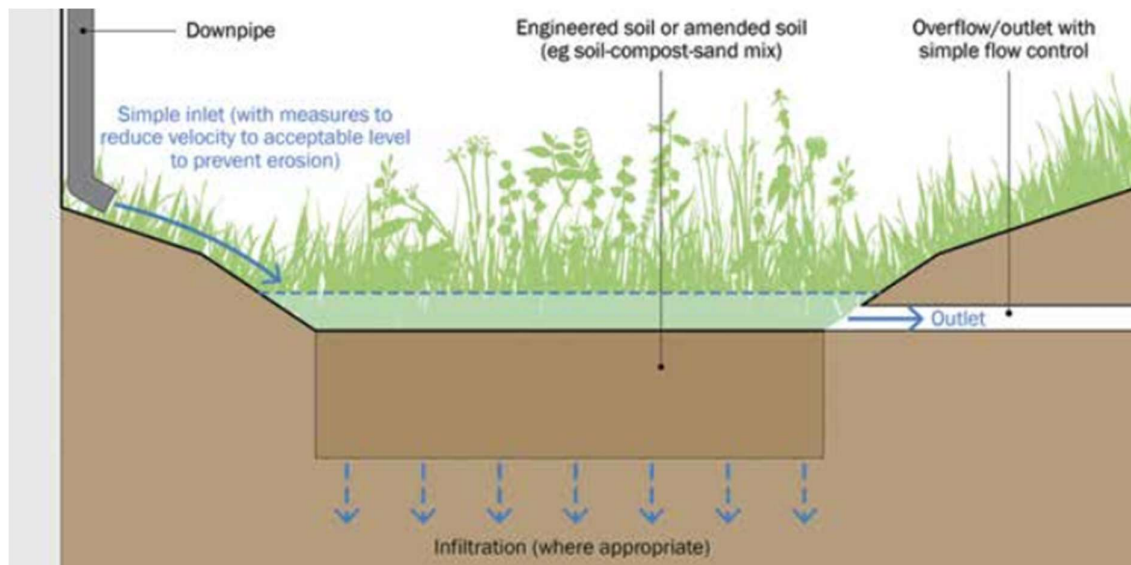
Section through a simple rain garden with outlet pipe (CIRIA C753)
